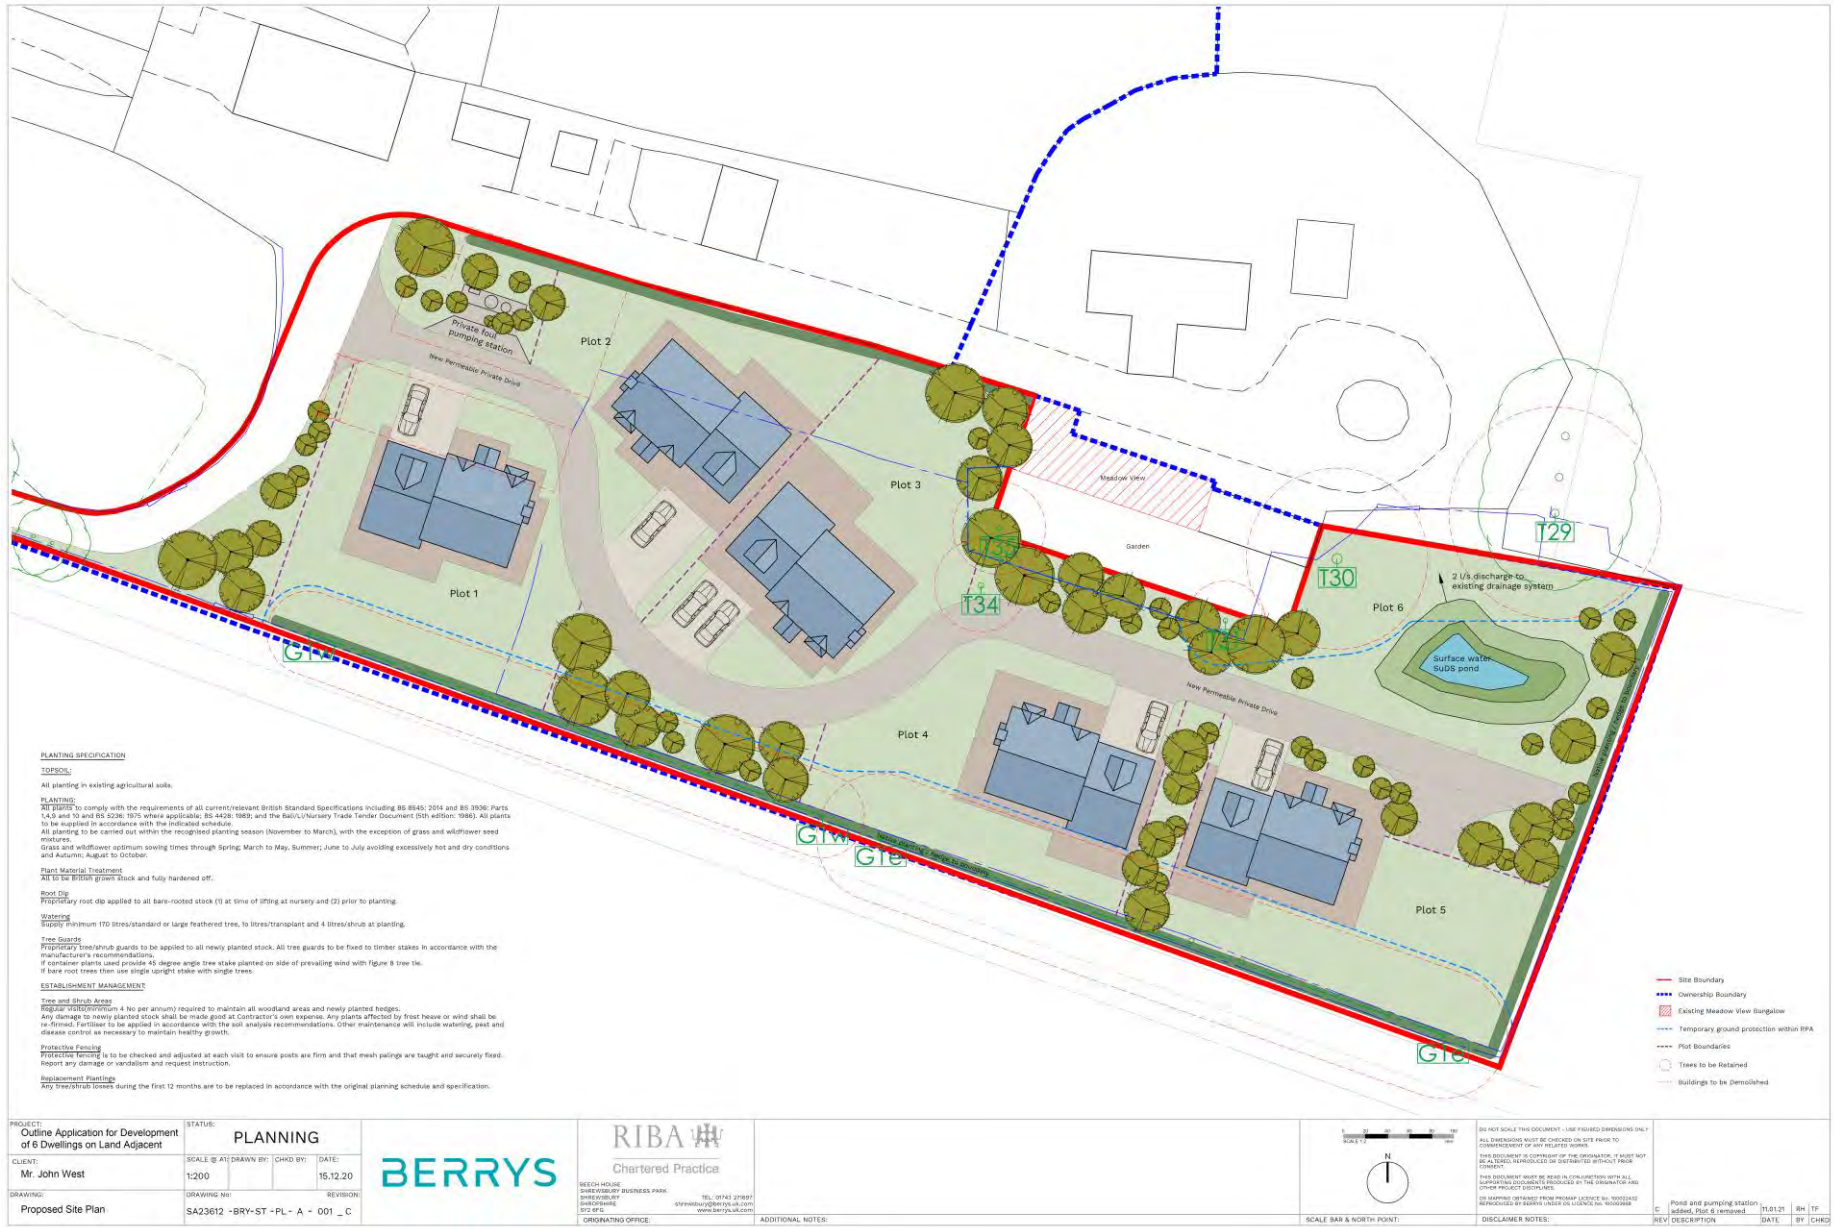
Outline planning consent 18/01258/OUT for 5 dwellings to the north of the site
